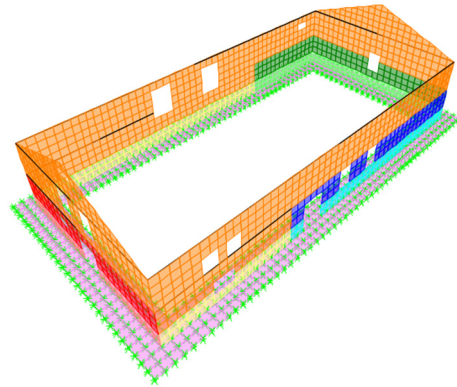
Variant 2 3D model of the masonry structure without the timber roof.
